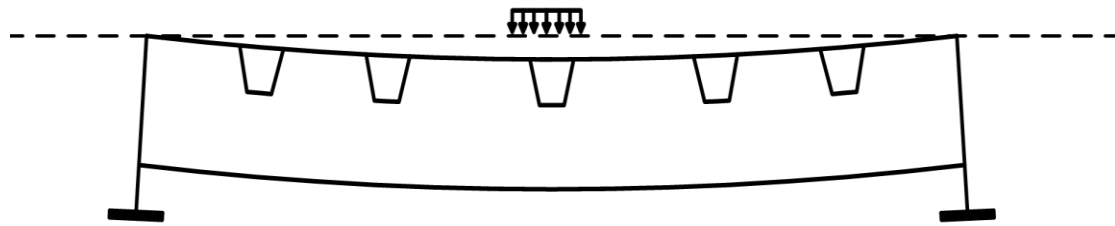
Load is transmitted from the ribs to the main girders through the floor beams (US Department of Transportation, 2012)
